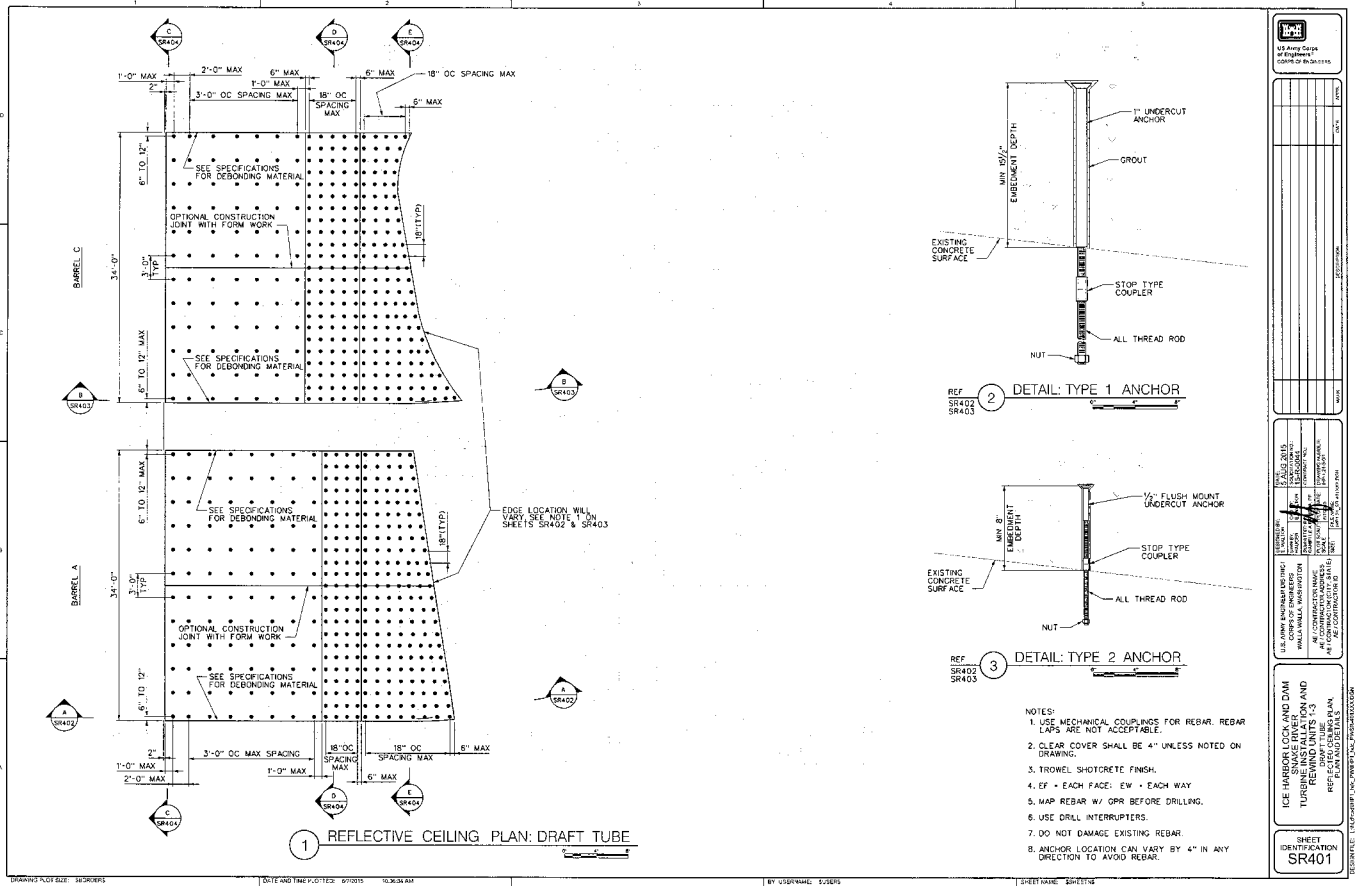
Reflective ceiling plan for reinforced shotcrete modifications to draft tube
